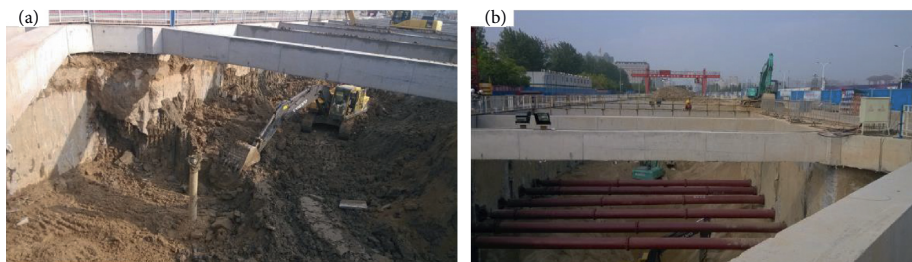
Working site of the Qianhu Avenue Station construction: (a) earth excavation; (b) retaining structure.
